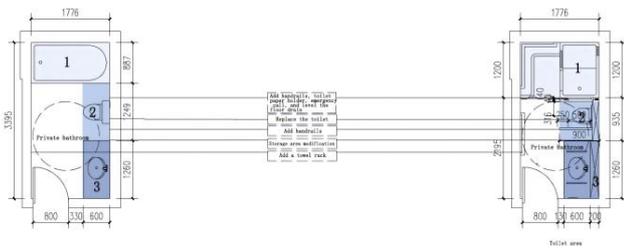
Modified Floor Plan of the Toilet Area in the Master En-Suite Bathroom (Source: Self-drawn)
